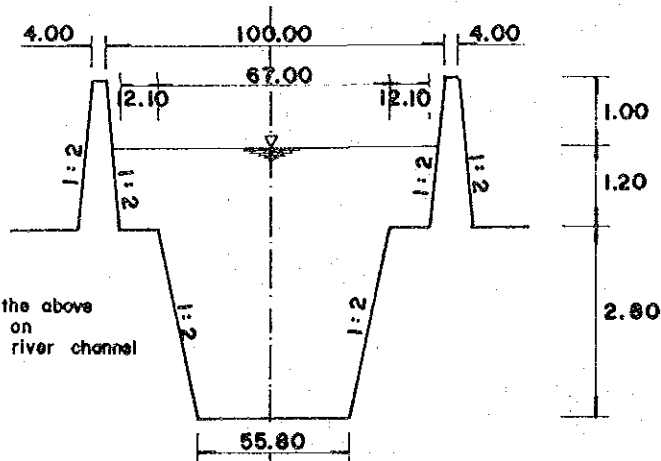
TYPICAL RIVER CROSS-SECTIONS FOR COMPREHENSIVE PLAN (3/5)
